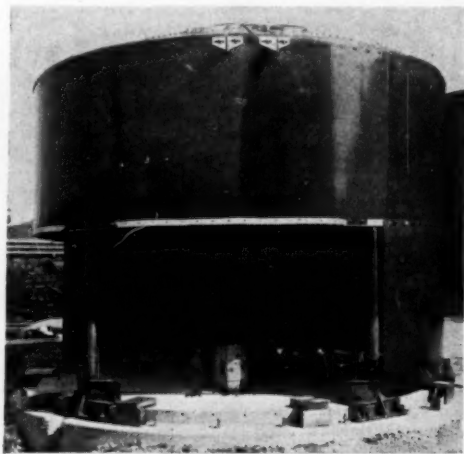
VIEW OF ROOF, TOP SECTION, AND PART OF THE SECOND SECTION
